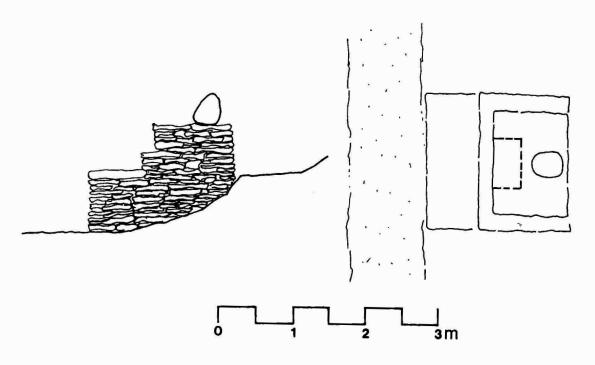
, 10: Shrine of Surmādevī at Chiti, ground plan and view from south.
